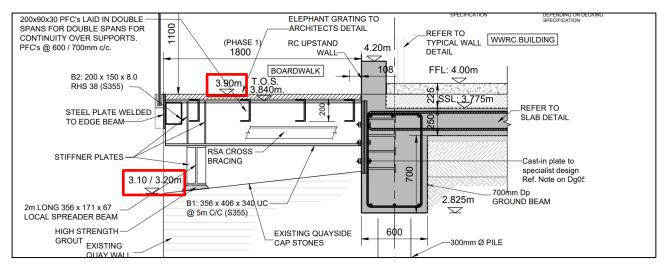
Cross section of boardwalk (Planning Report, Urban Agency)
